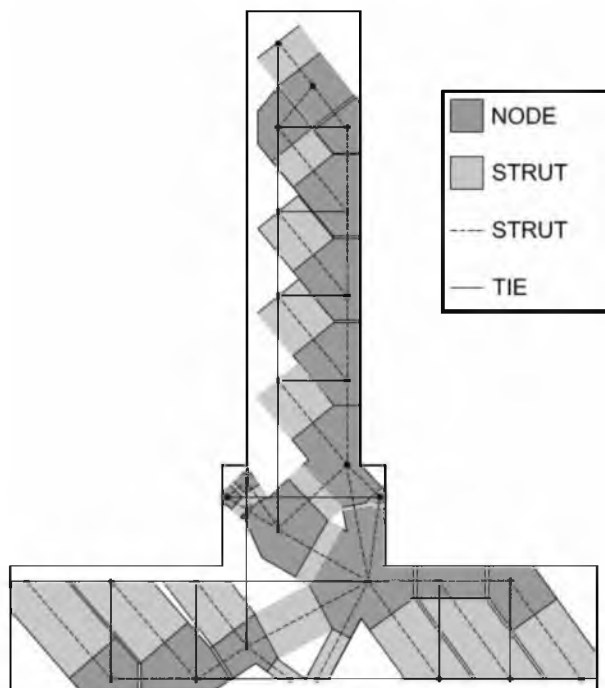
Strut widths used to determine the member areas of LEN-2 Repair
